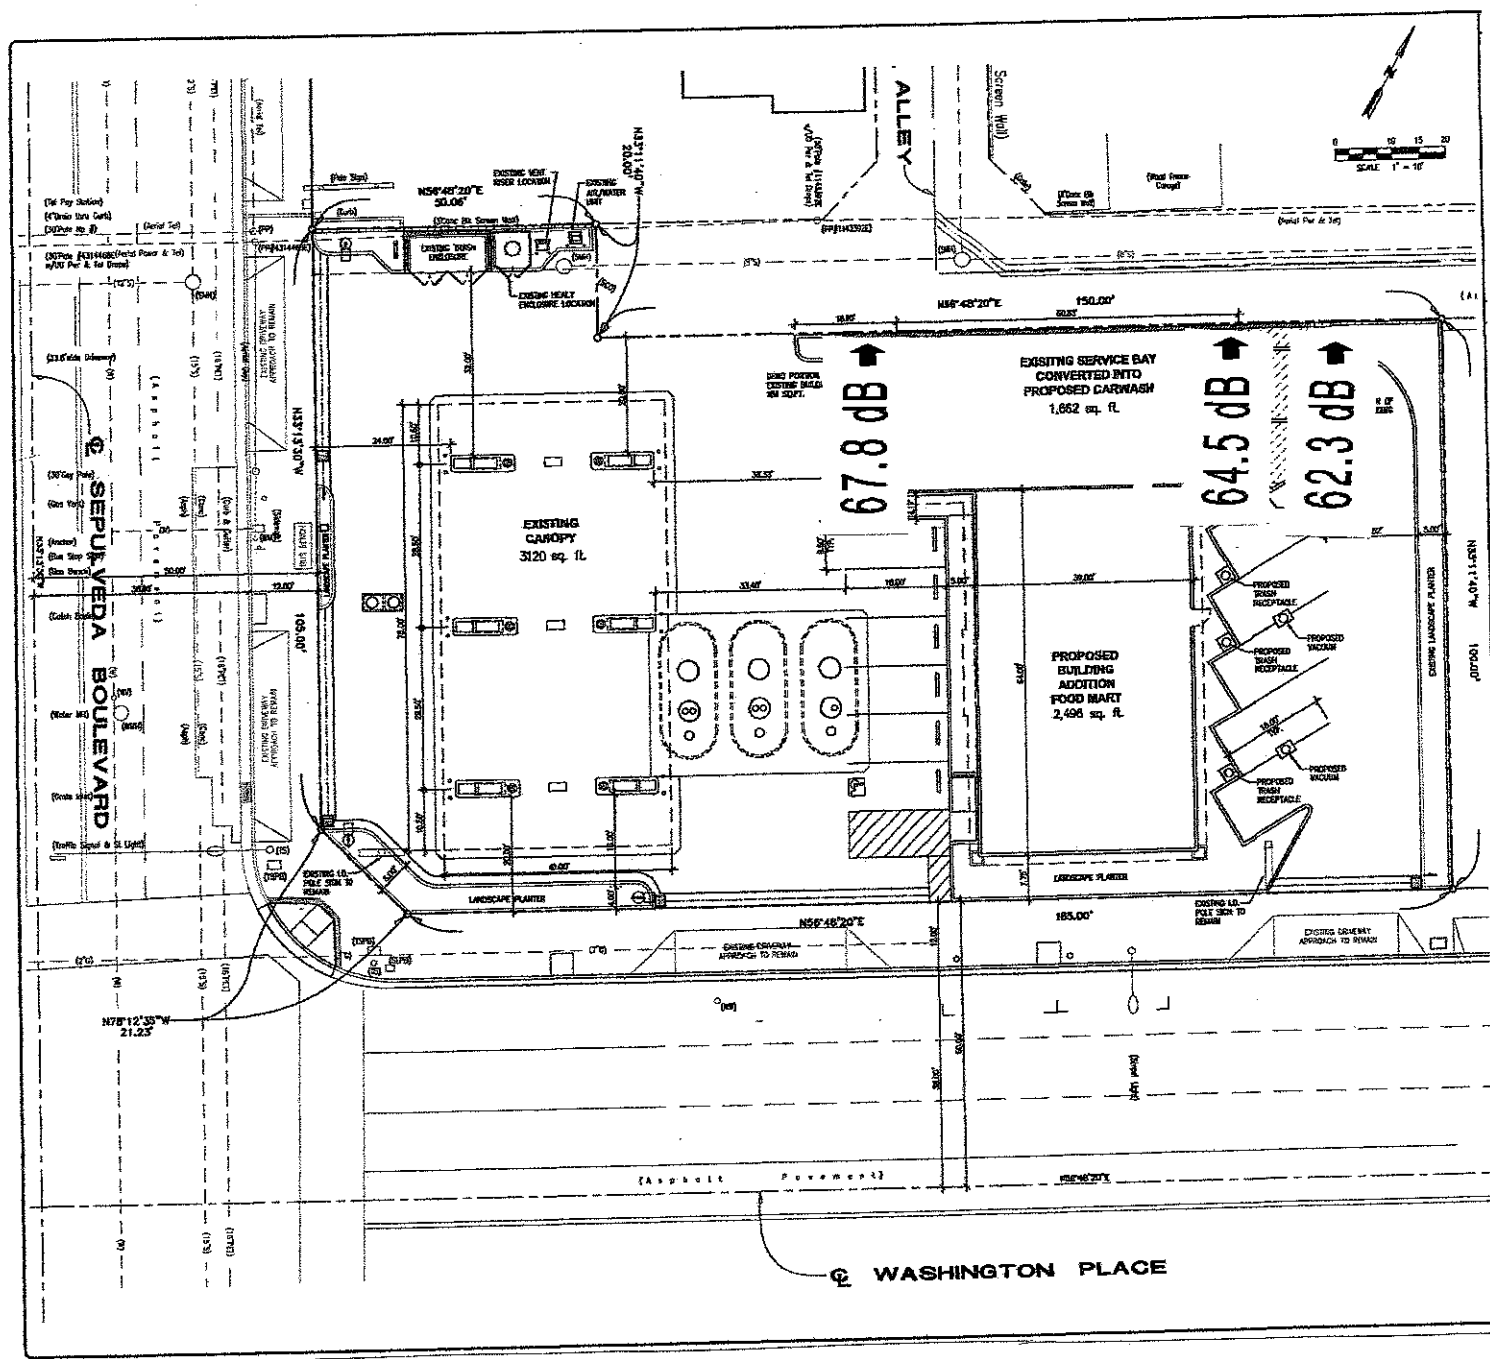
Site Plan Showing Unshielded Car Wash Noise Levels at the North, and Northeast Property Sides for Culver City Site
